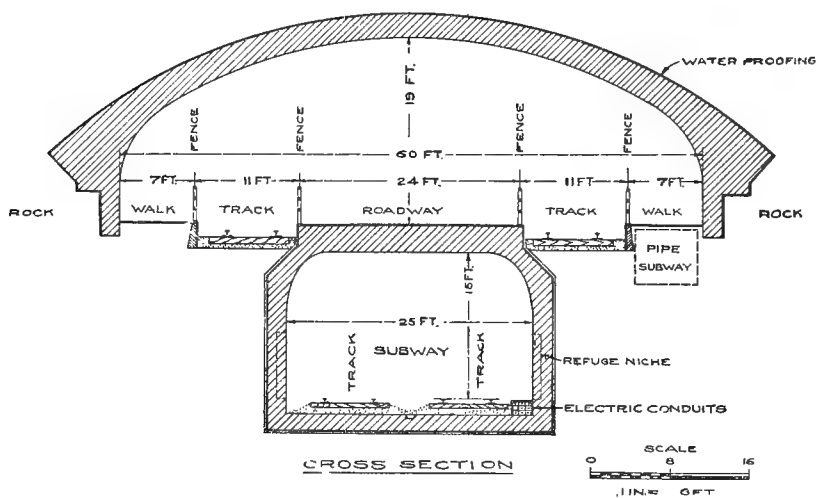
TYPICAL CROSS-SECTION OF COMBINED TRAFFIC-TRANSIT TUNNEL.
